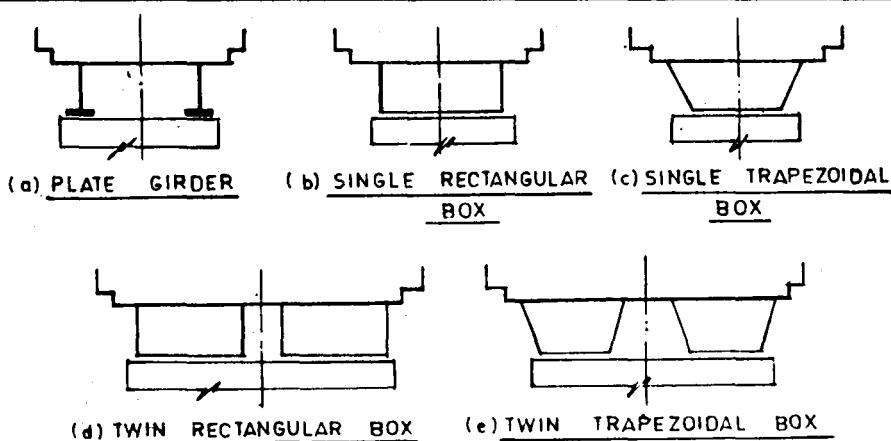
VARIOUS DECK CROSS-SECTIONS
